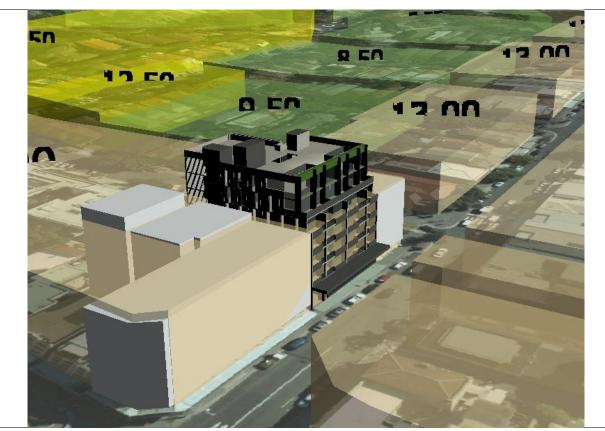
Height of proposed building in the context of the Hall Street streetscape (subject site shown in rendered effect, existing buildings shown in grey block form and LEP controls shown in dark beige where height control is 15m, light beige where height control is 13m, green where height control is 9.5m and yellow where height control is 12.5m). *Source: 3D Modelling Officer, Waverley Council
